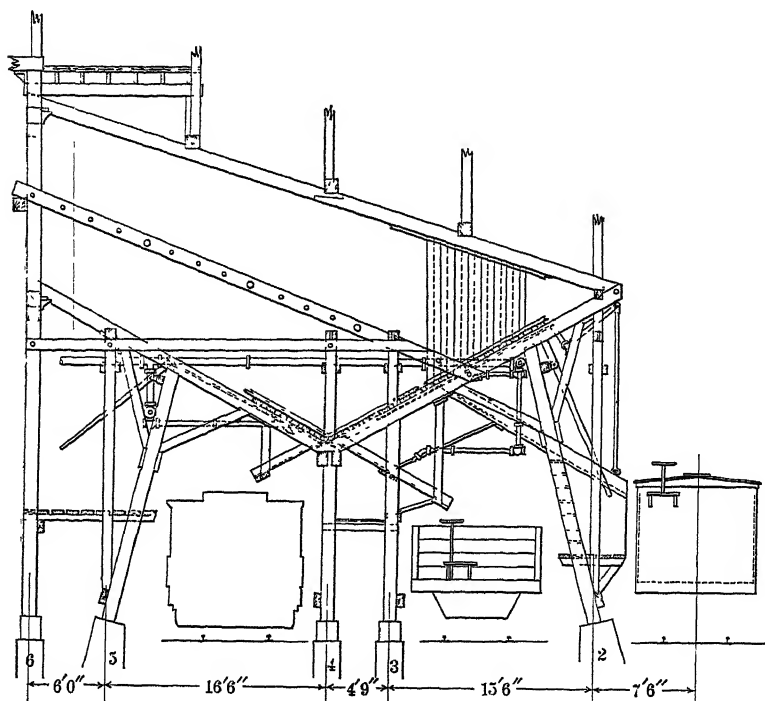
SECTION THROUGH LOADING-POCKETS OF BREAKER SHOWN IN FIG. 4.
